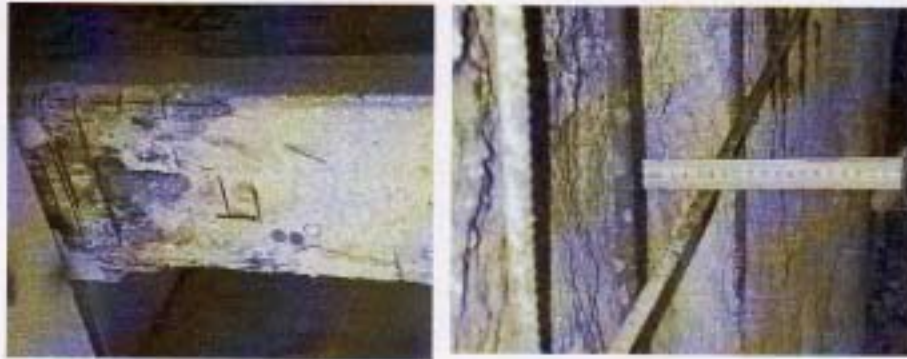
Corner spalling and steel deterioration of a prestressed beam (left). Piers spalling; the damage was deep almost 70 mm (right)
